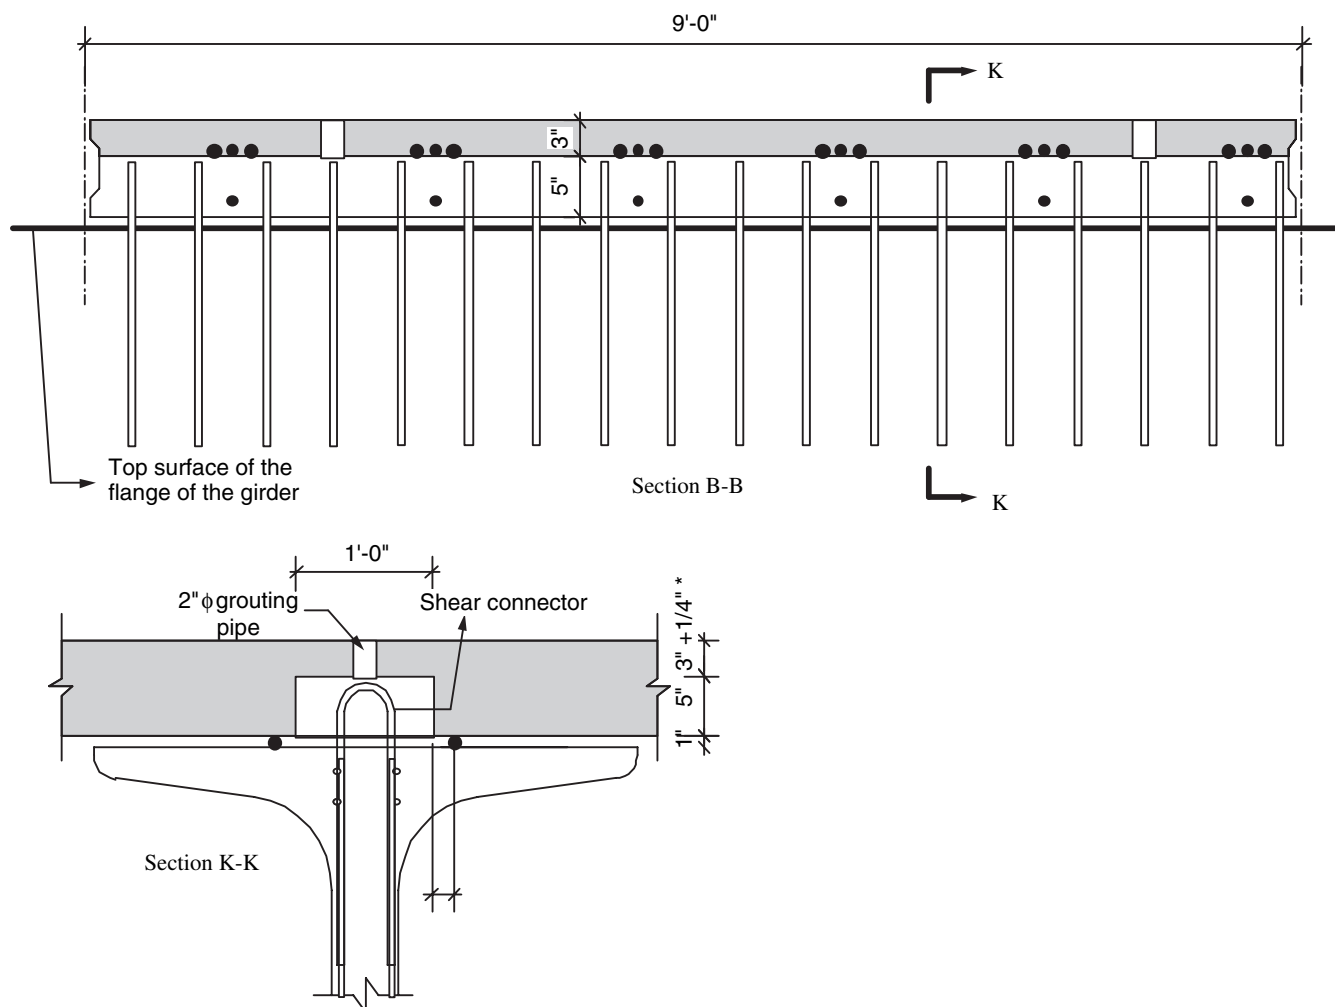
CD-2, Sections B-B and K-K for precast concrete girders (* $\frac{1}{4}$ in. is used as a sacrificial layer for texturing).
